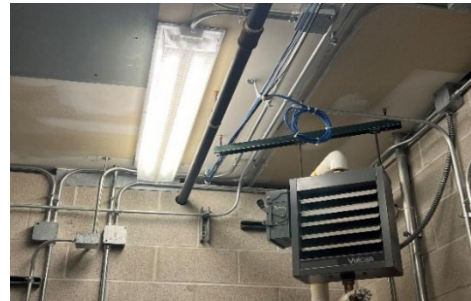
Damaged ceiling in the Fire Panel/Electrical room removed and replaced.
